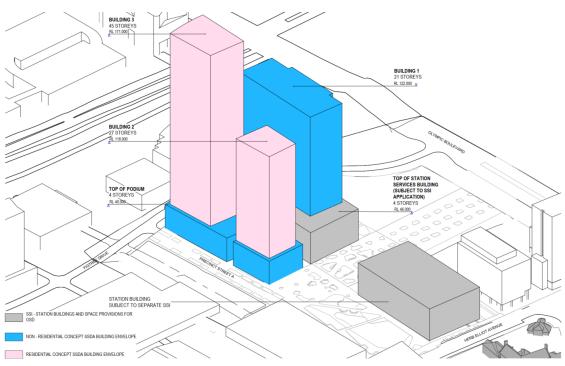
Proposed Concept SSDA development and CSSI scope
